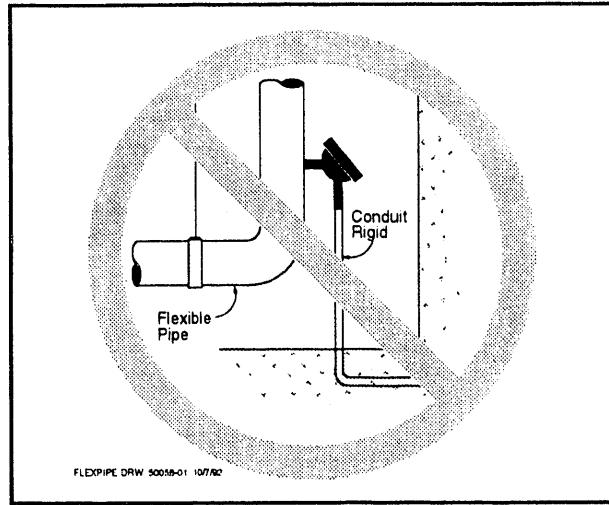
Motion of flexible pipe can damage attached conduit
